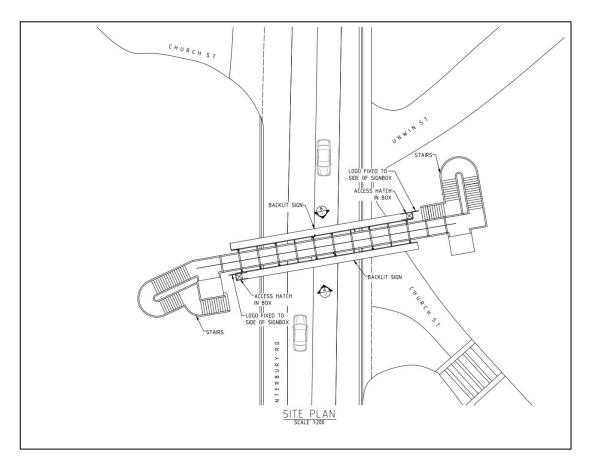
| Site plan (Source: Revised architectural plans 01/11/24)
